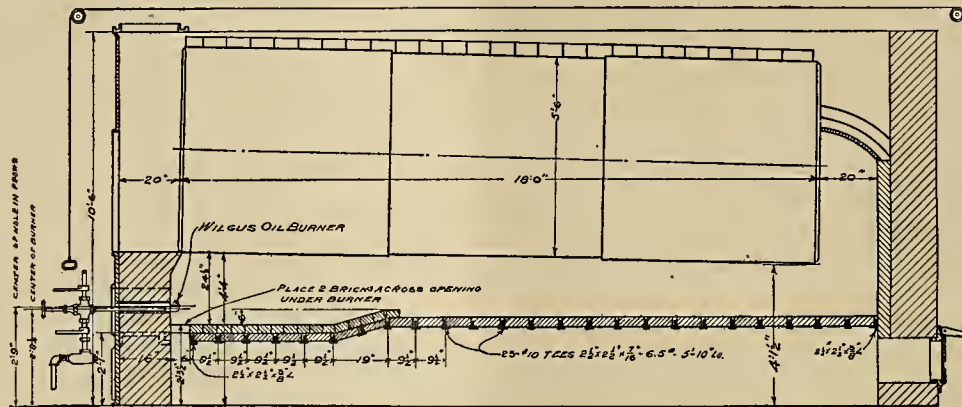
Setting for Wilgus Burner Under Return Tubular Boiler.
